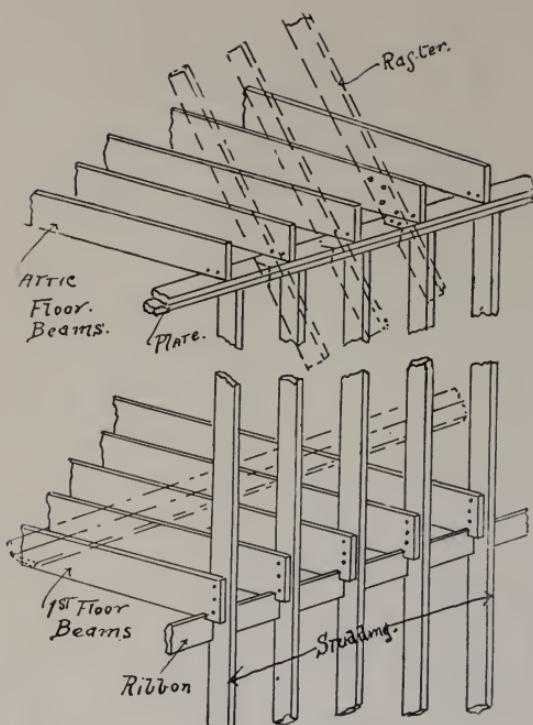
FLOOR JOISTS, STUDS AND RAFTERS.
